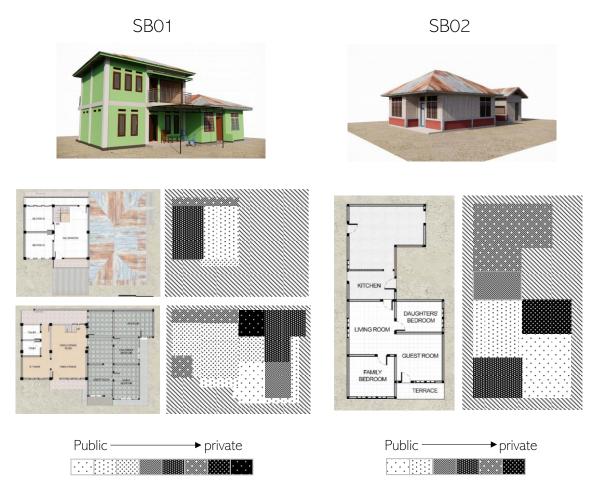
SB's houses in Wae Mata with 3D render, floor plan and layout analysis
